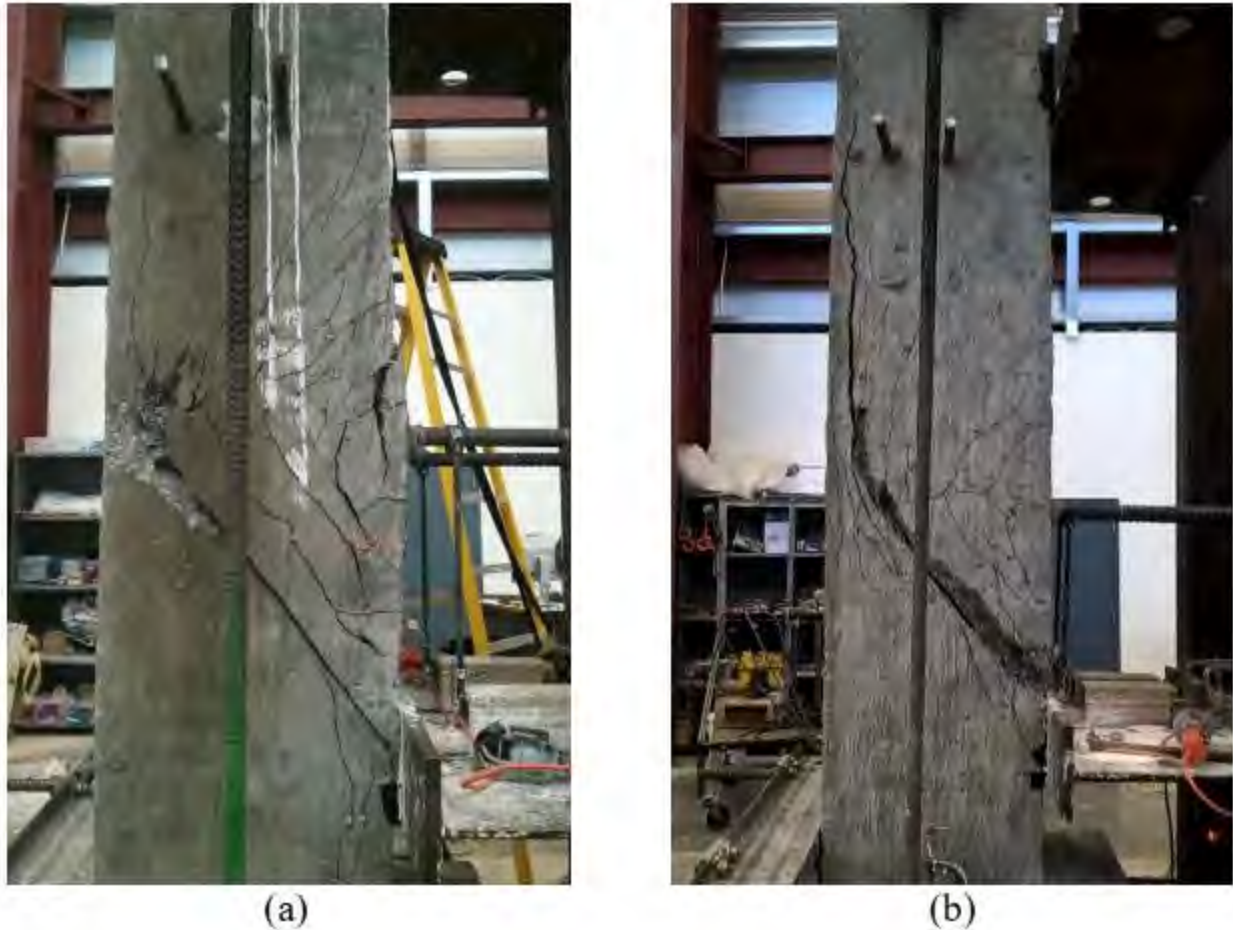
Concrete breakout (a) cone-shaped (b) back cover spalling (Shao et al. 2016)
